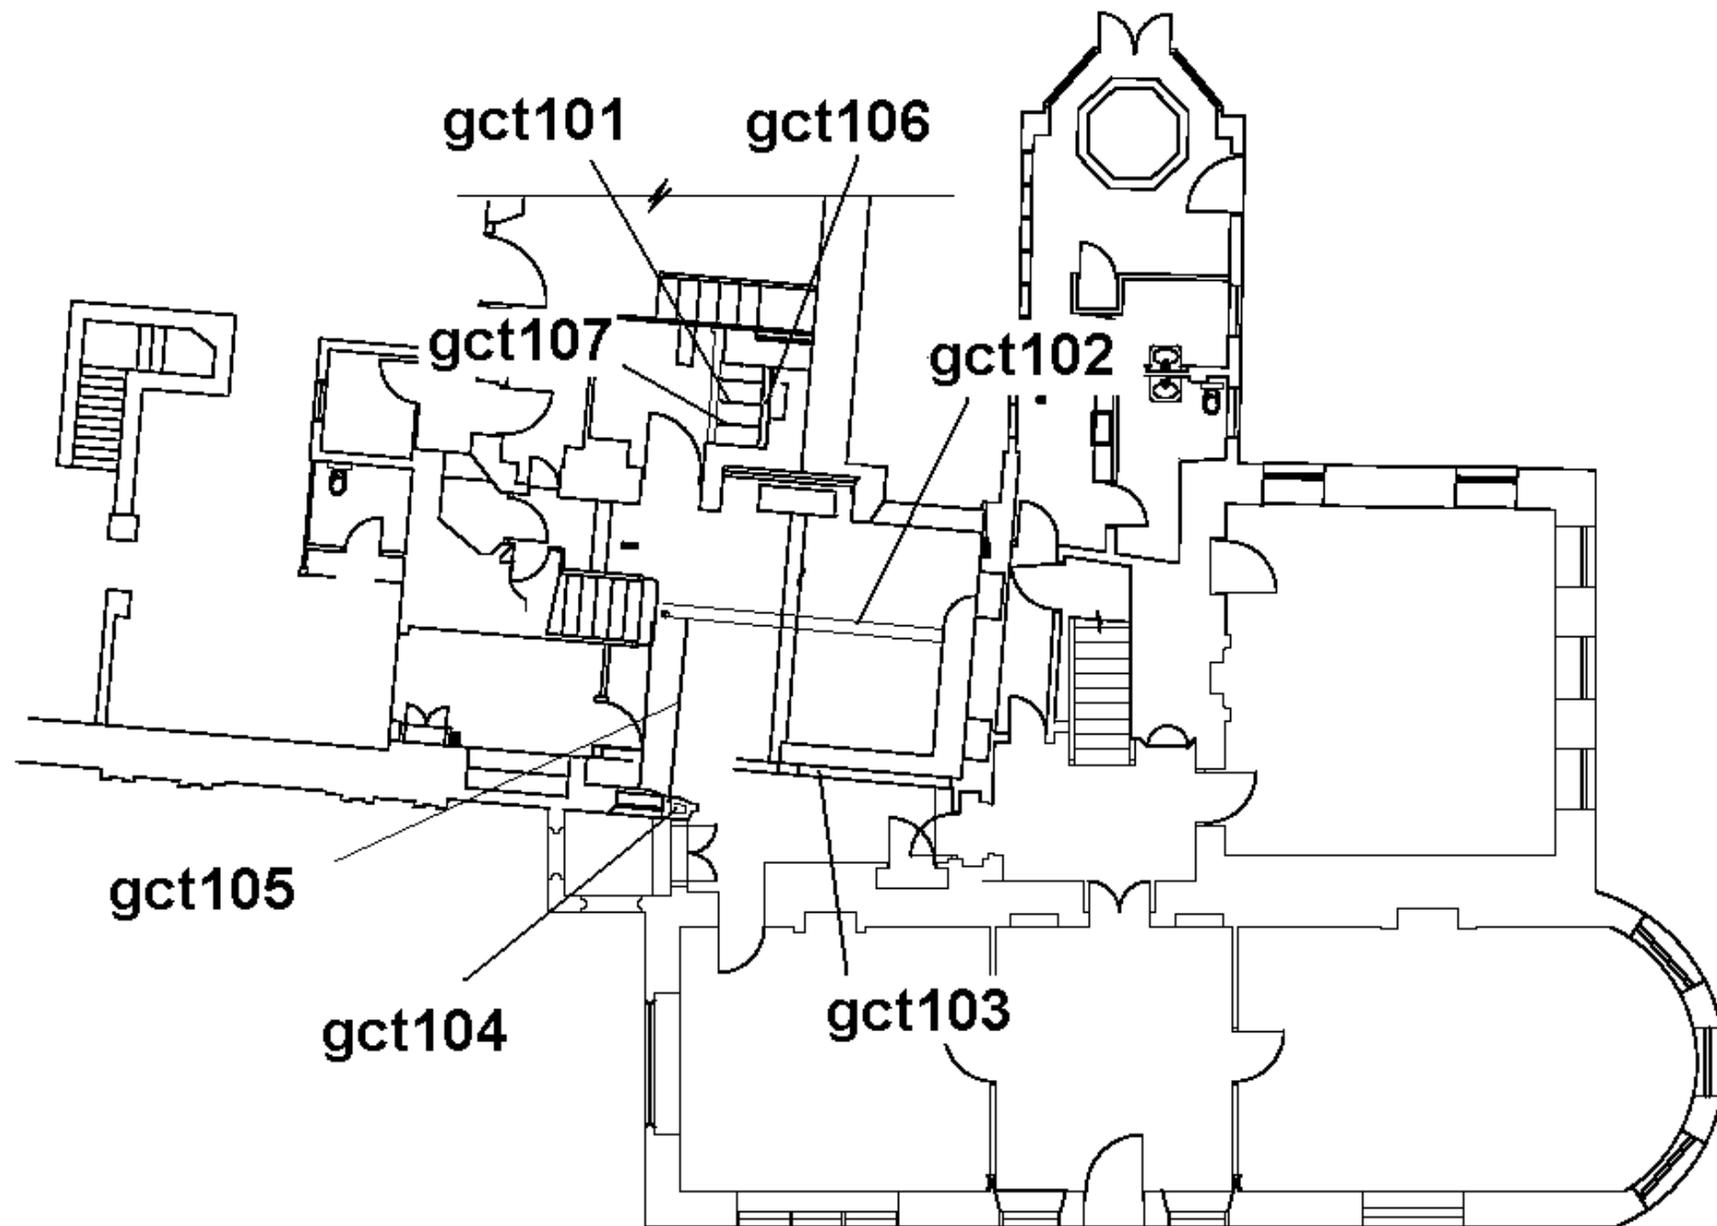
Greys Court ground floor plan showing the approximate whereabouts of some of the timbers sampled for dendrochronology.
